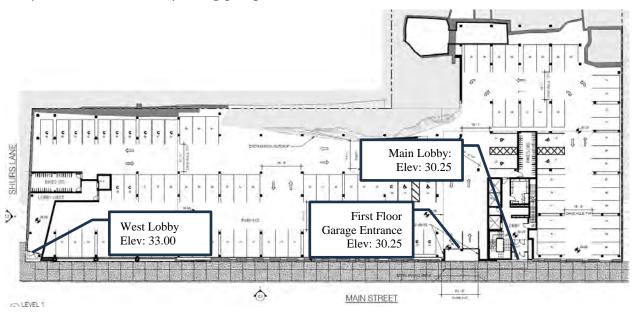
First floor building access points (per CBP Architect 3/11/24 plans)
